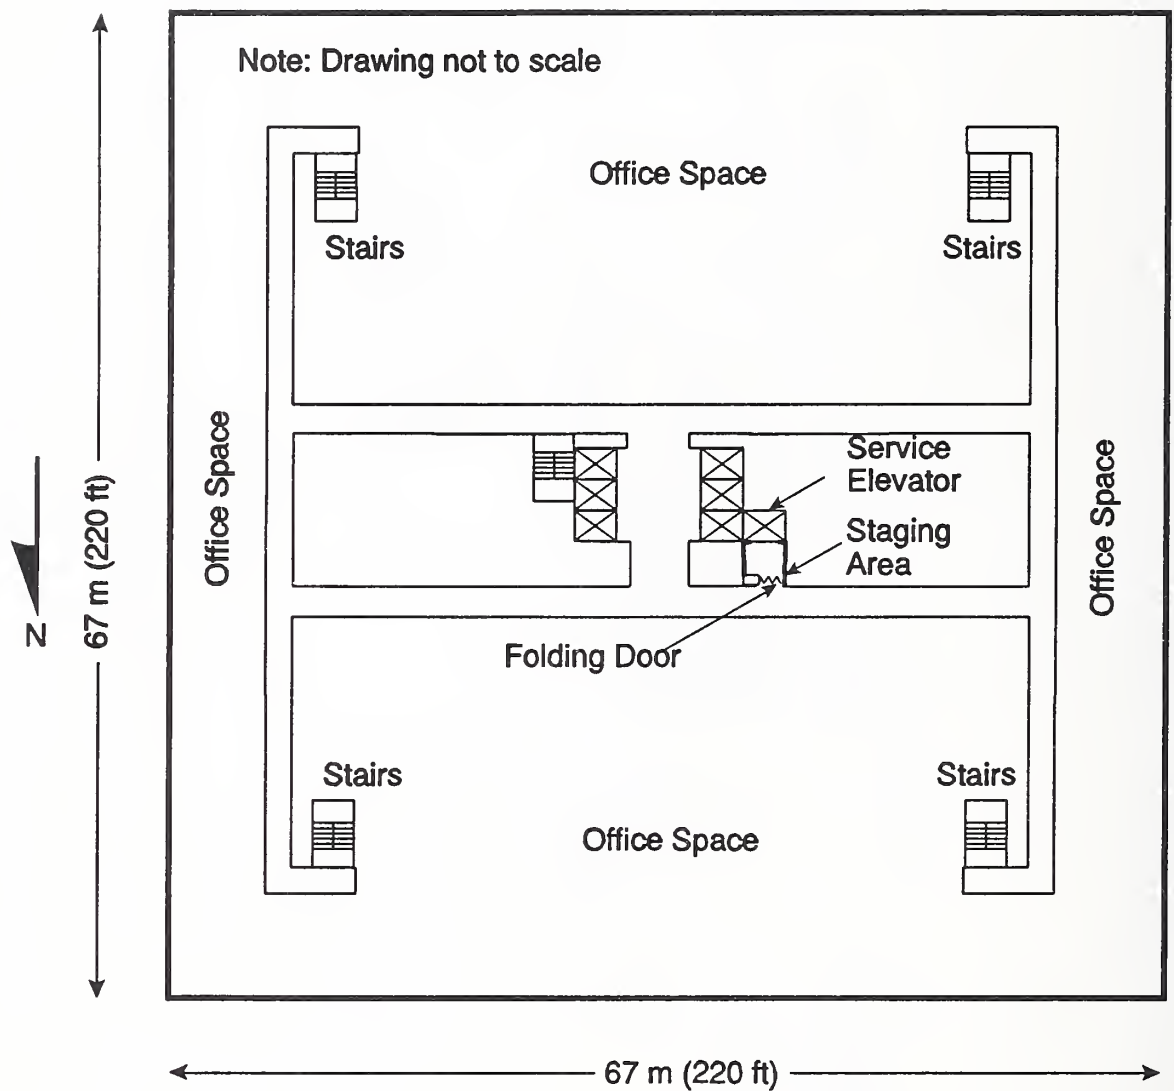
Typical plan of floors 2 through 6 of the Whipple Federal Office Building
